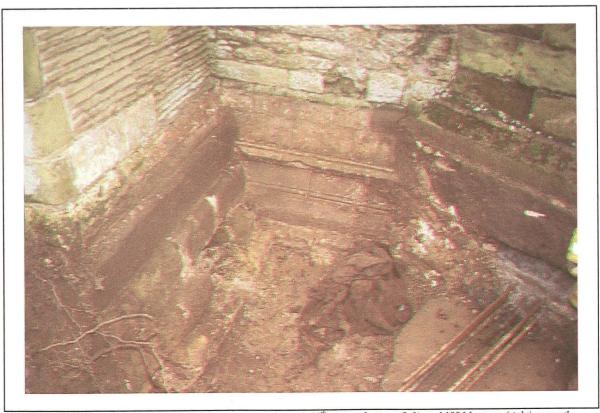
View of interface between original tower masonry (centre), 15th century buttress (left), and 1886 buttress (right) on north side of tower - looking south
